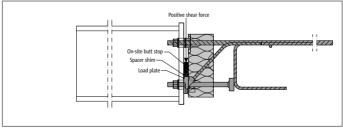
Schöck Isokorb® type KS: On-site butt stop for transferring shear forces
